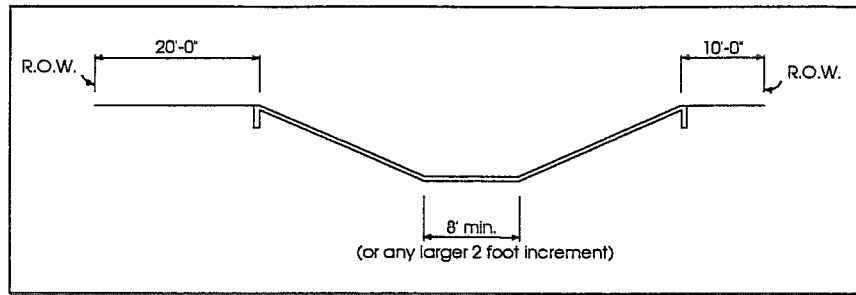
illustrates a cross-section of a typical concrete-lined channel. All partially or fully concrete-lined trapezoidal channels must meet or exceed the following minimum design requirements:
